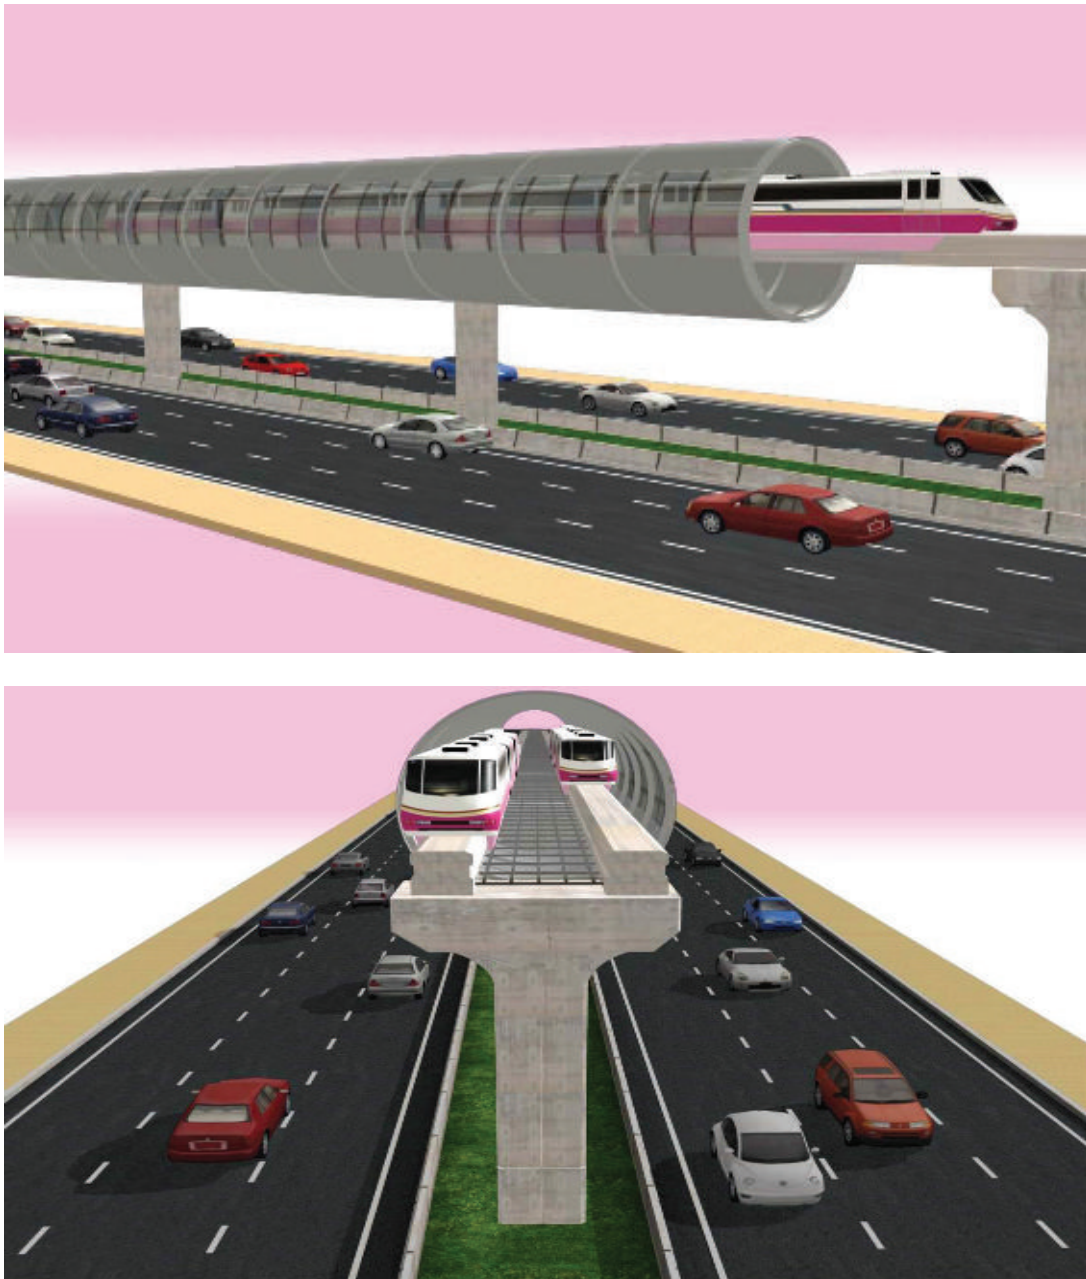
Noise Barrier of Solid-Wall Tunnel Type
